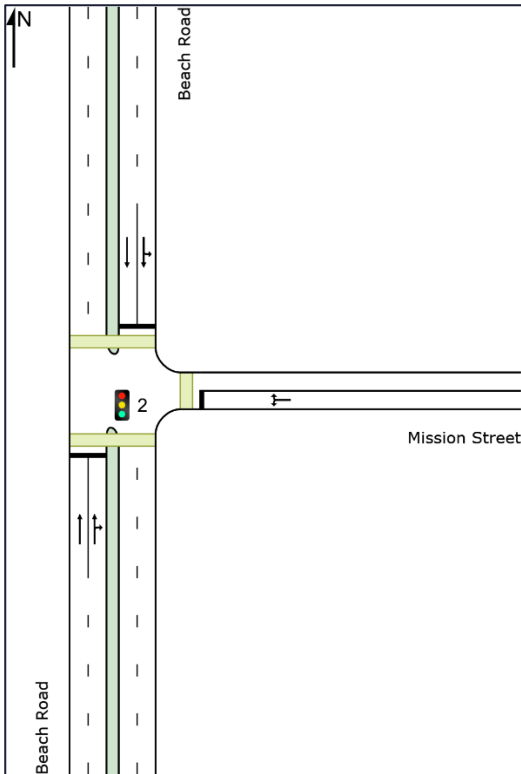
Existing Intersection Layout: Beach Road and Mission Street
